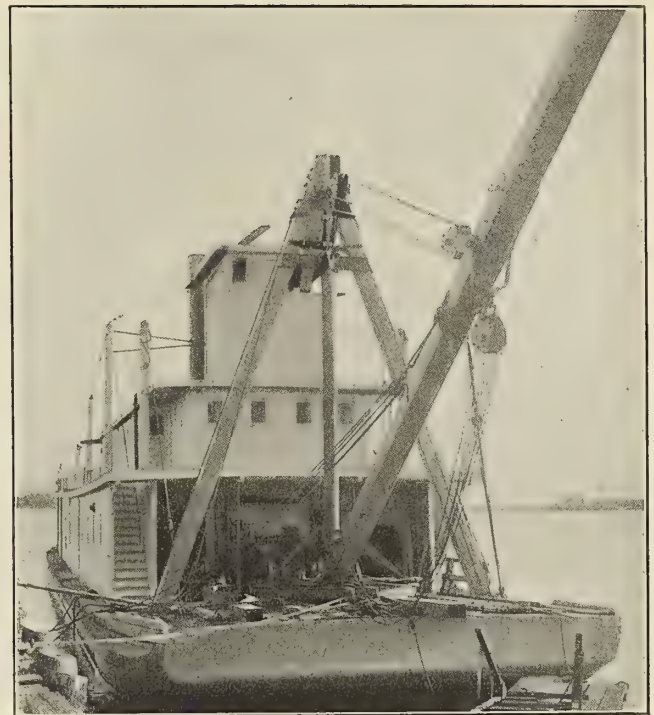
End View, Showing A-Frame and Derrick Boom
